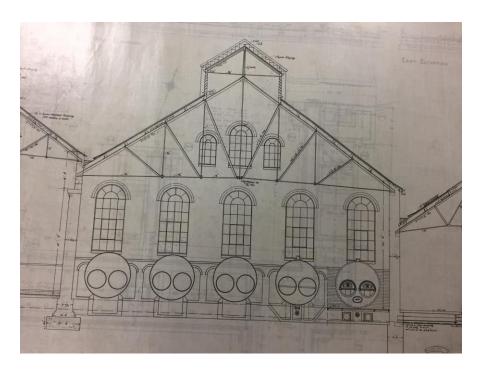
Plan elevation of the boiler room including the Bellis and Morcam steam Engines (Oatley & Skinner, 1902)
